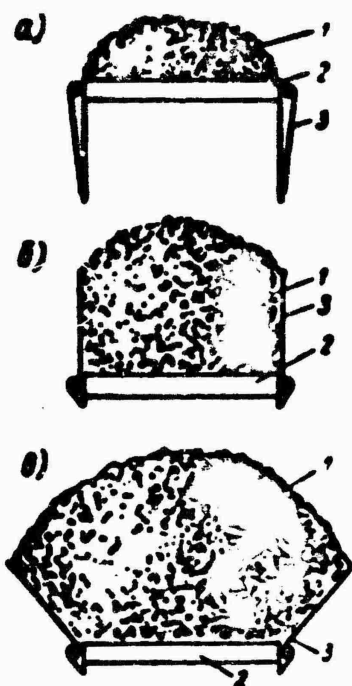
Wings hinged to the blade: 1) Soil being moved; 2) blade; 3) wings.
